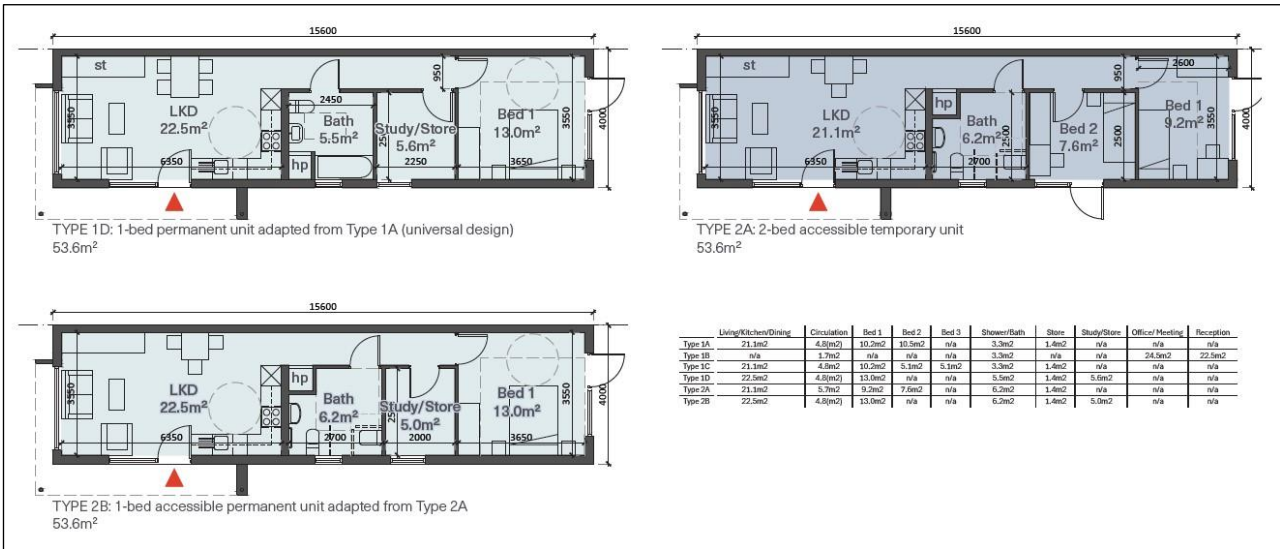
Modular unit plans (Source: O'Mahony Pike Design Statement, 2024) (2/2).
